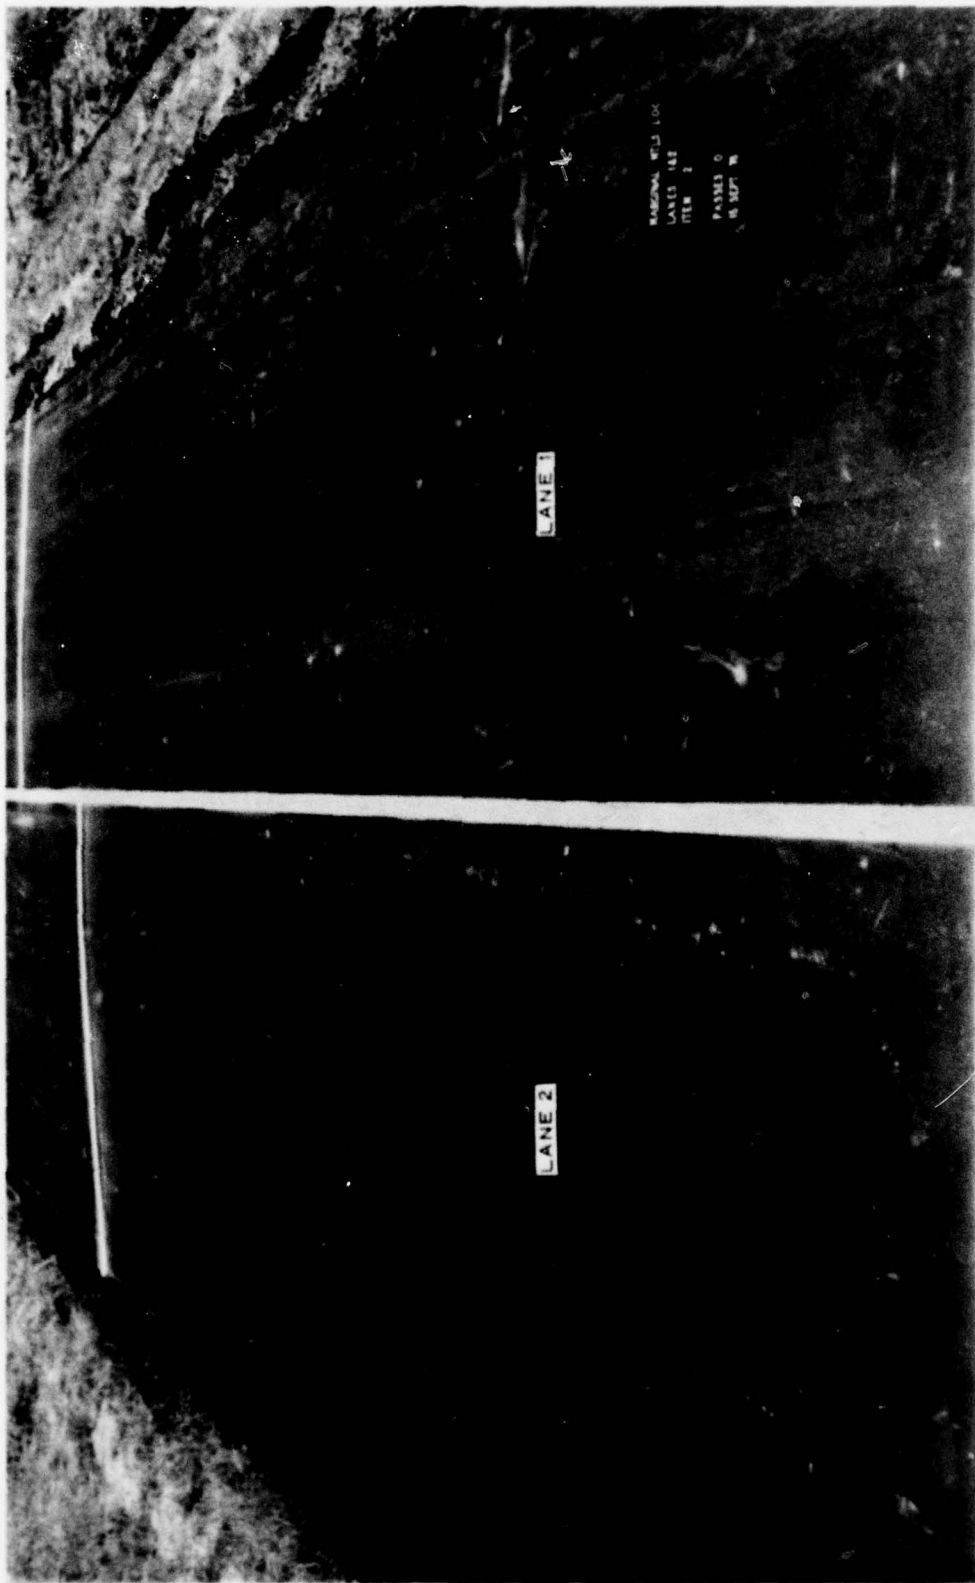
General view of item 2 (flexible pavement) prior to traffic
